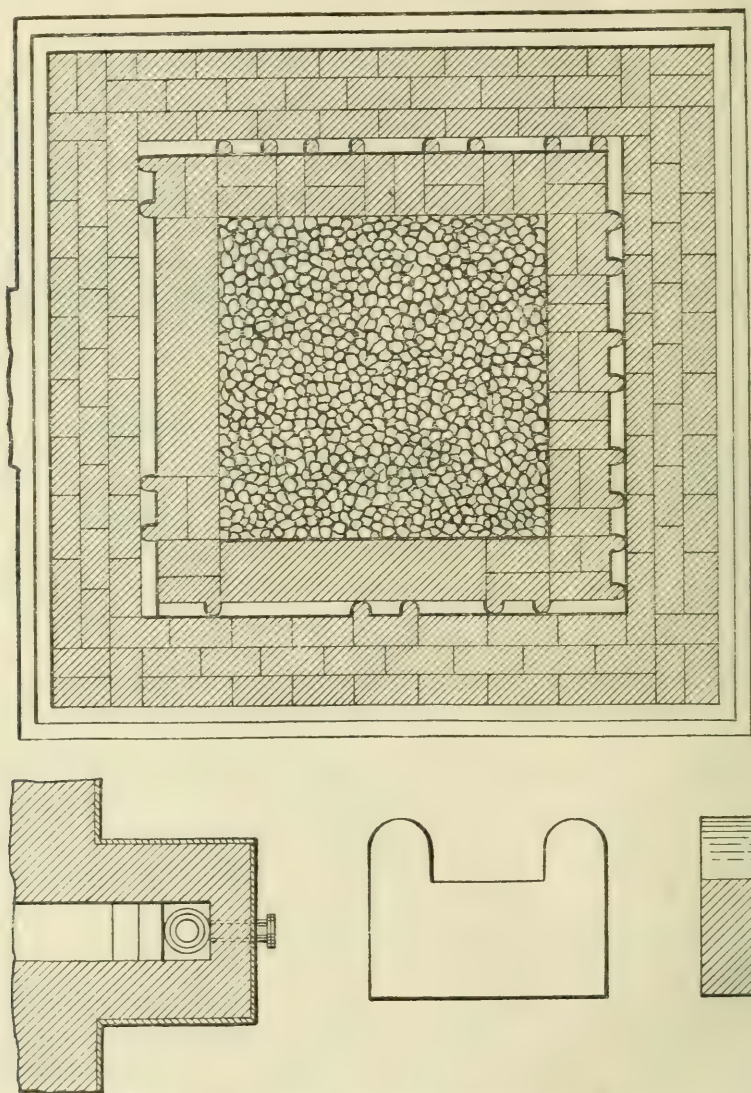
Kalbpery, acid-proof masonry, cross section.
